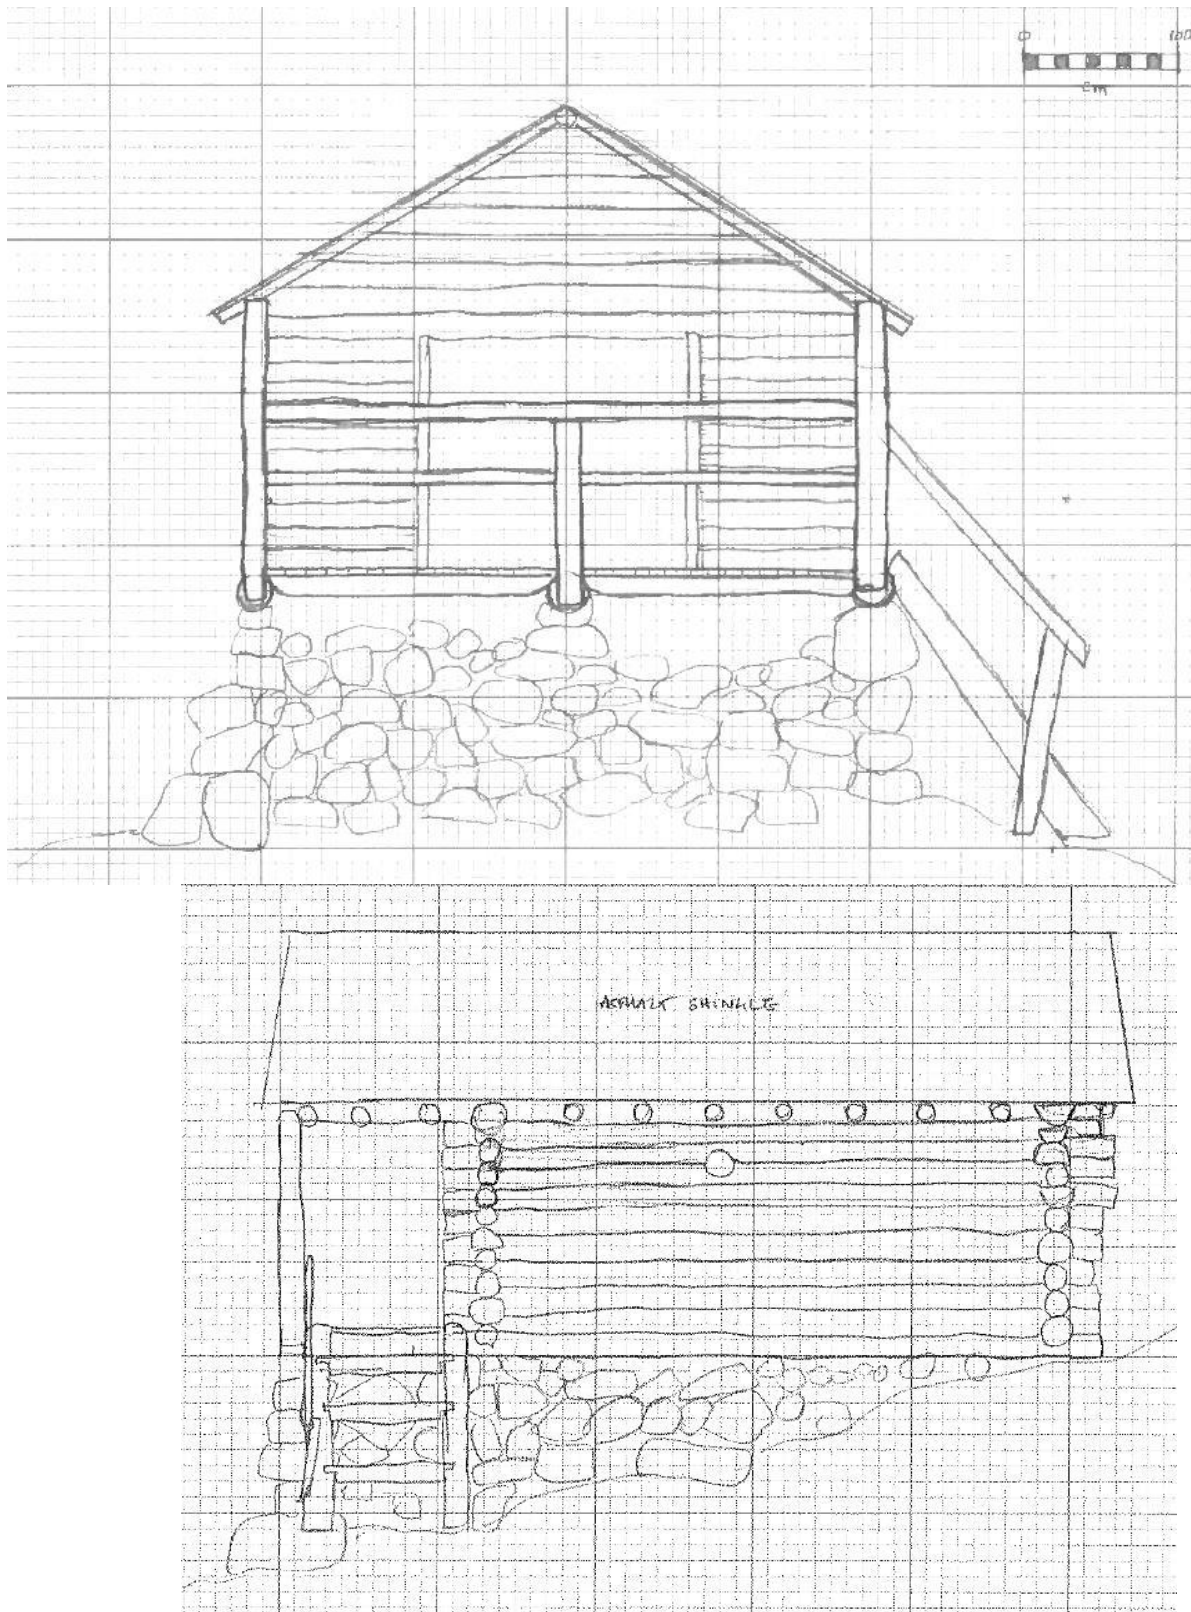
Guyot shelter drawings. Above: East (front) elevation. Below: North (side) elevation. August 23, 2012.
